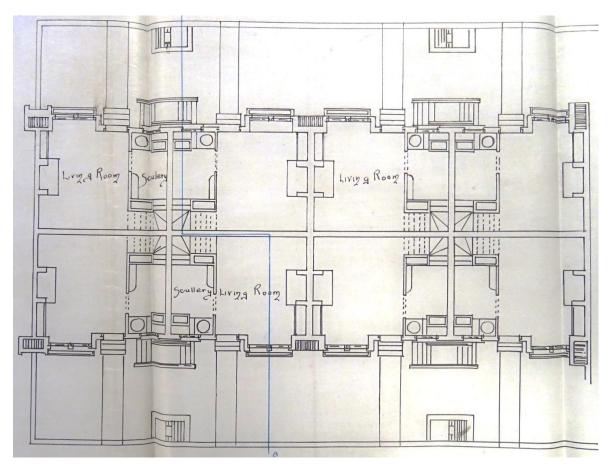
The first floor plan shows the living room and scullery. The scullery contained a sink, set-pot and built-in cupboard (Carby Hall 1896a).
